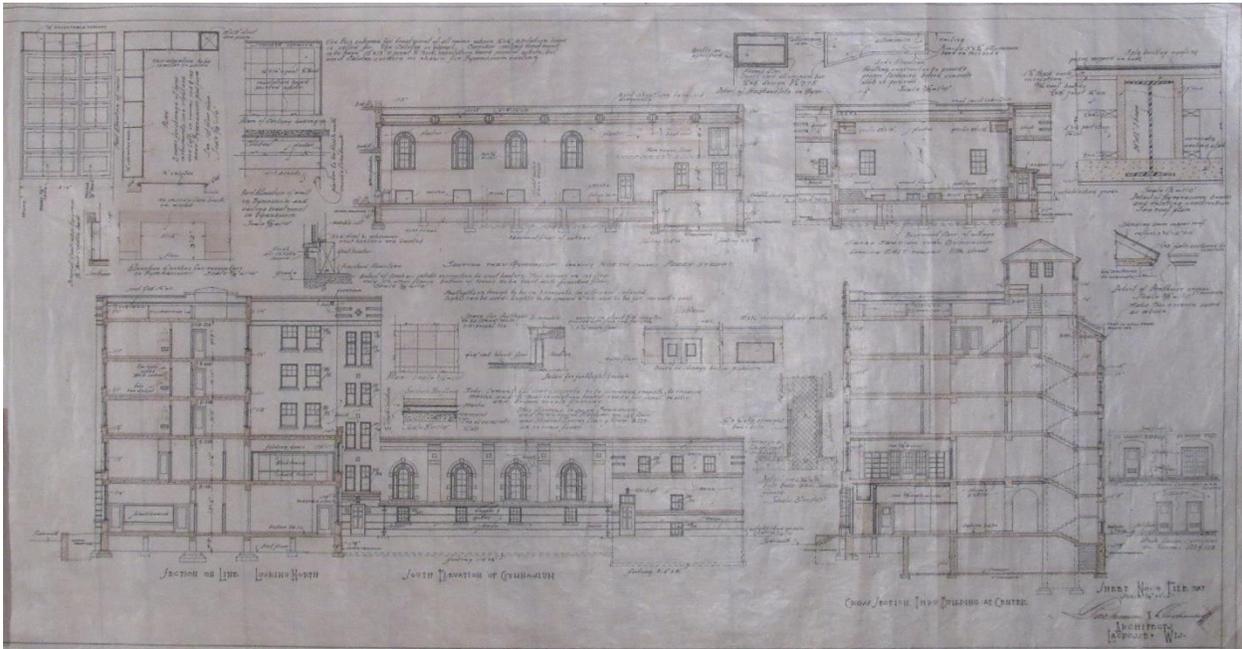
Original construction documents. “Building Sections” Sheet 4. 1 April 1941.
